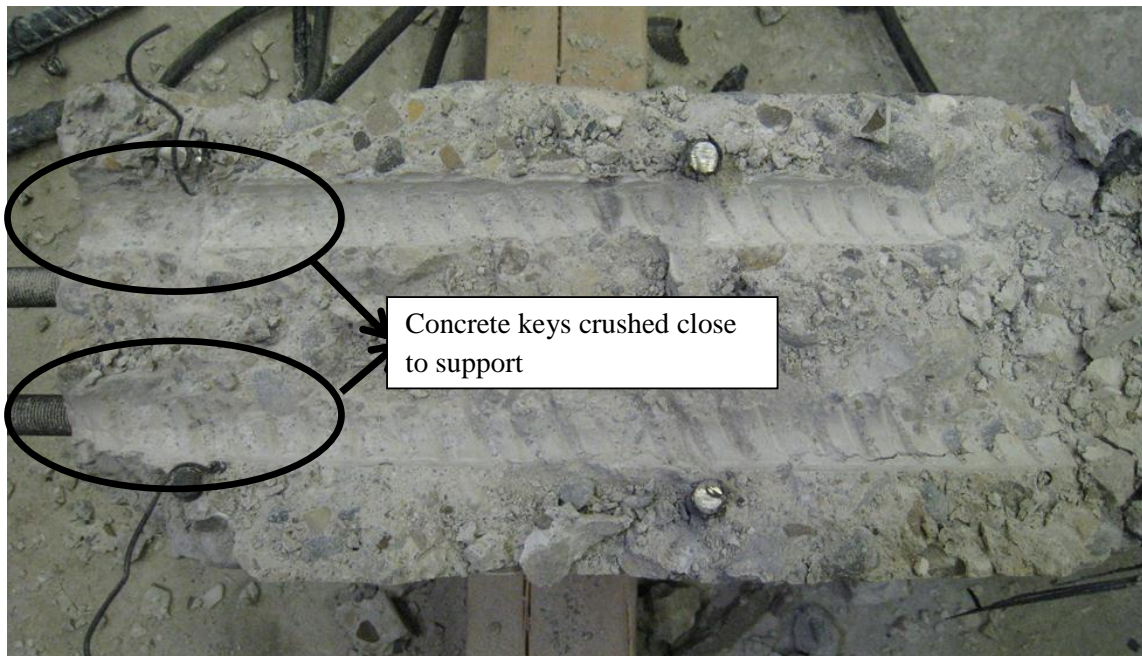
Beam F-A-60-0 after failure and removing the reinforcing bars. The beam was turned upside-down.
